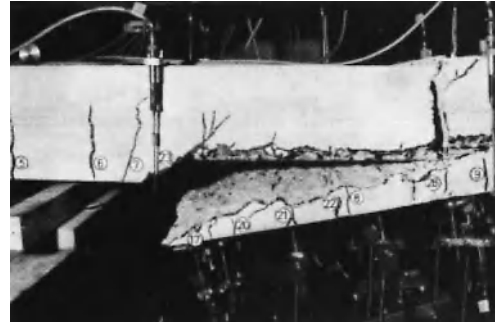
Failure of a reinforced concrete slab consisting of a precast concrete girder and cast in-situ concrete without connecting reinforcement (Rehm, Eligehausen, Paul (1980))
